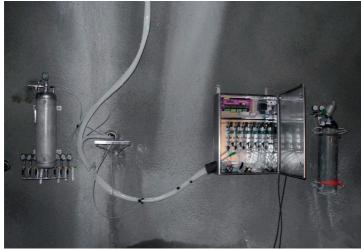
Arrangement for in-situ monitoring of water pressure with instrument cabinet with pressure sensors and logging unit. High pressure hoses are connected to the drill hole sections for measurements, and to the far left a vessel with pressurized water to keep the packers which section the holes constantly inflated. This measuring principle was used for the Karmsund, Ulvin and Forsmark test sites.
